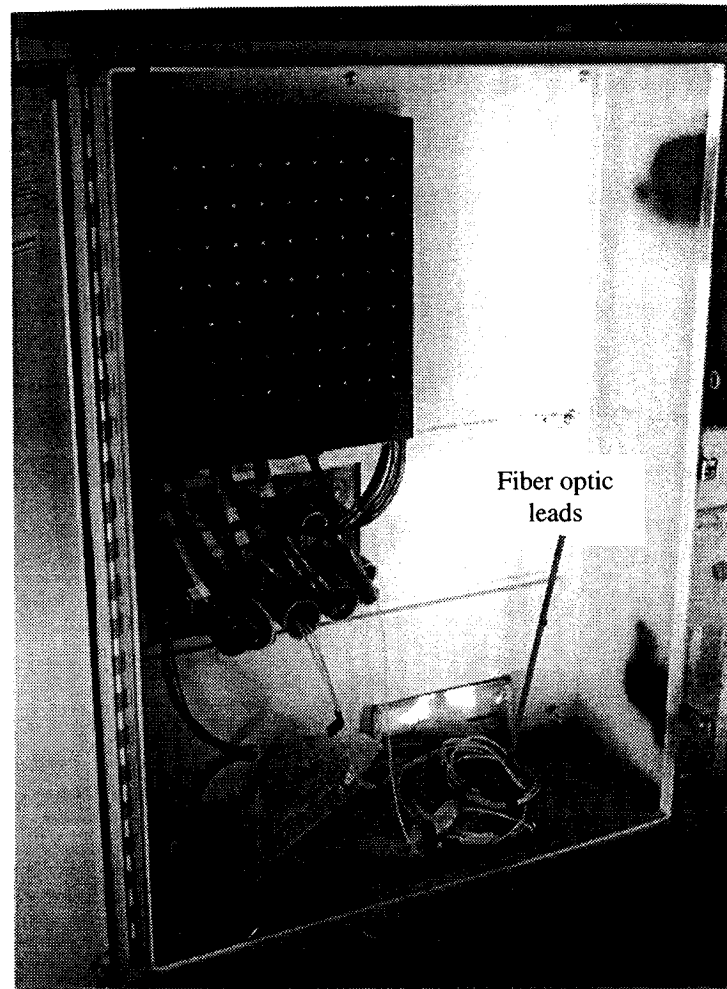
Instrumentation box at Waterloo Creek Bridge deck [Tsai and Ventura, 1998]
